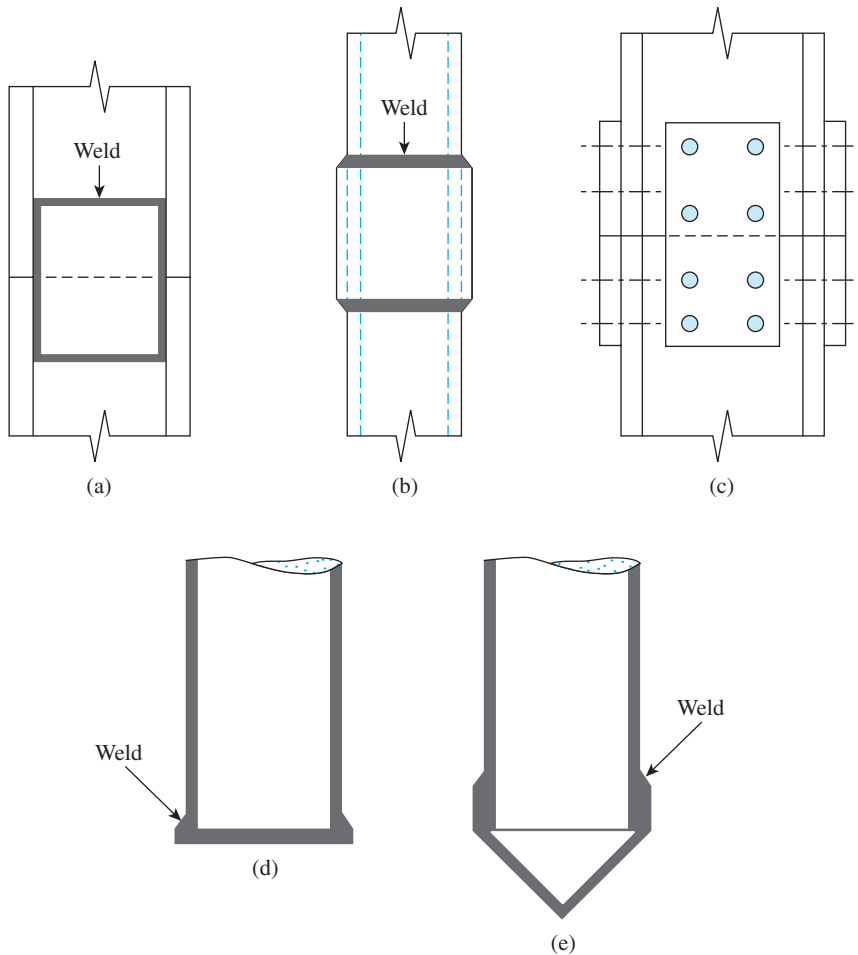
Steel piles: (a) splicing of H-pile by welding; (b) splicing of pipe pile by welding; (c) splicing of H-pile by rivets and bolts; (d) flat driving point of pipe pile; (e) conical driving point of pipe pile
